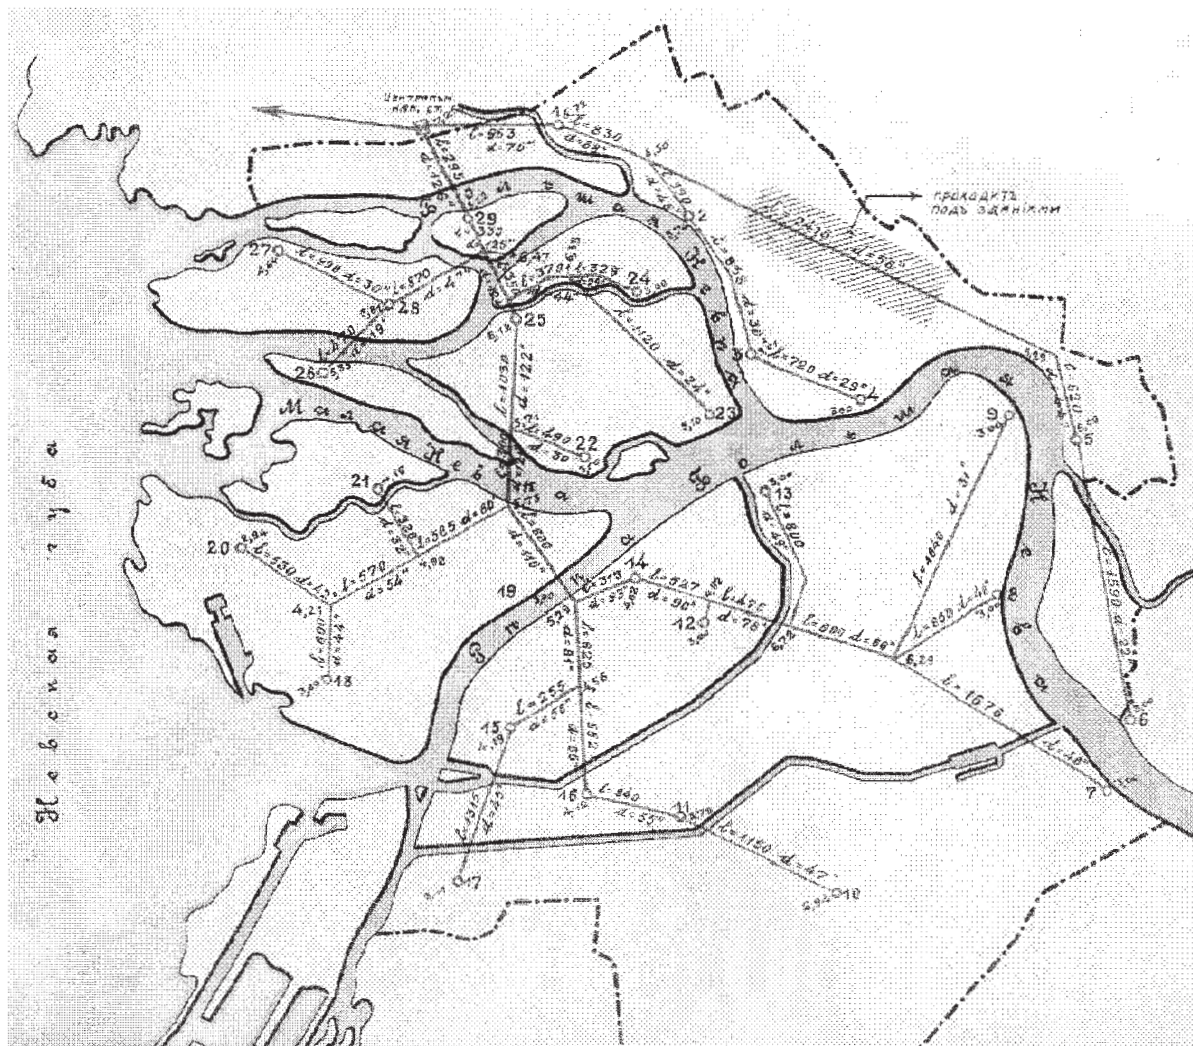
Plan of the main tunnel collectors by Ruzsky's design:
